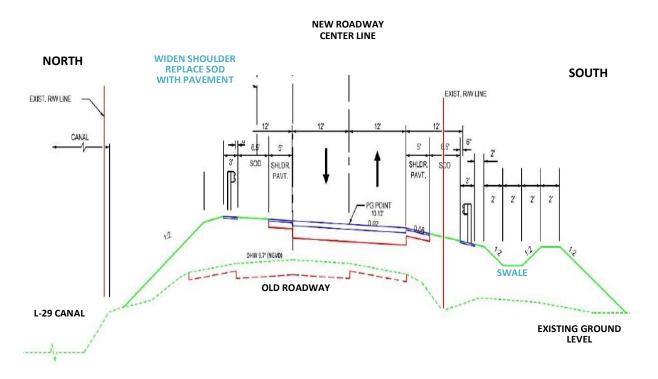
Typical cross-section of the reconstructed Tamiami Trail roadway. Alternative 2 would add the features labeled in blue, widening the shoulder by 1.5 ft., replacing the sod portion with pavement (FDOT recommendation), and adding a new swale system for stormwater treatment (new FDEP recommendation to meet water quality requirements).
